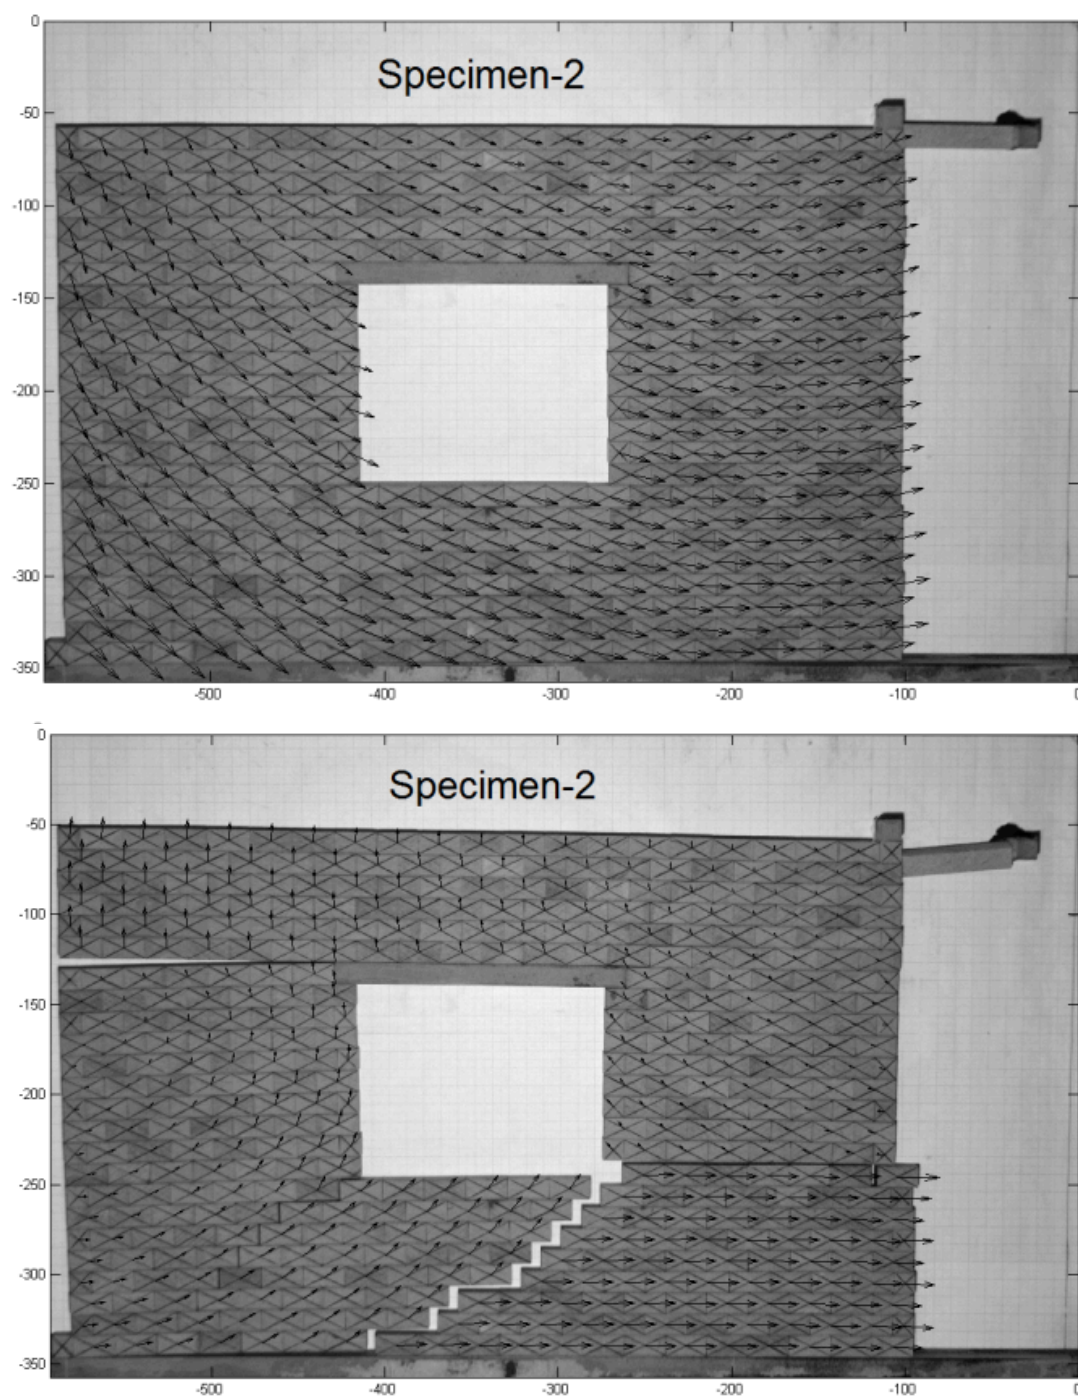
Displacement vectors for wall with opening specimen-2: Before (top), after (bot.) cracking
